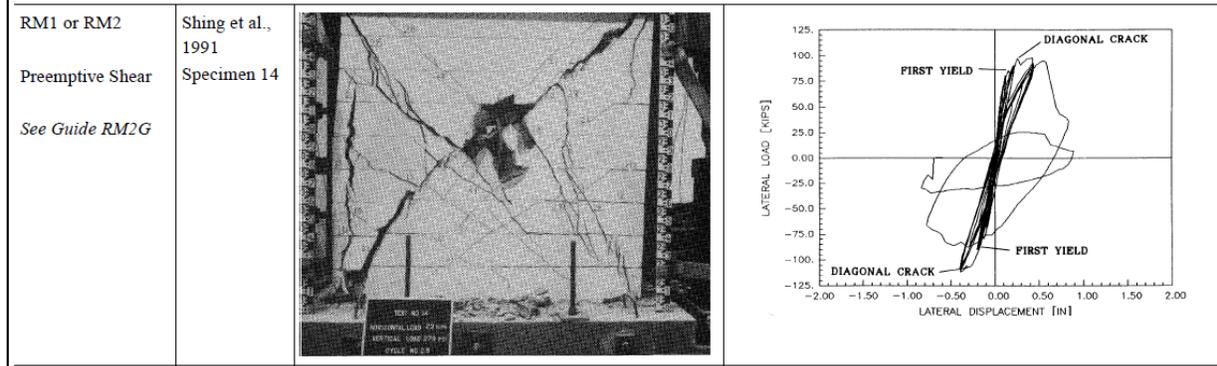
Cyclic Test Data on Walls with Brittle Shear Failure (FEMA 307 Table 3-1)
